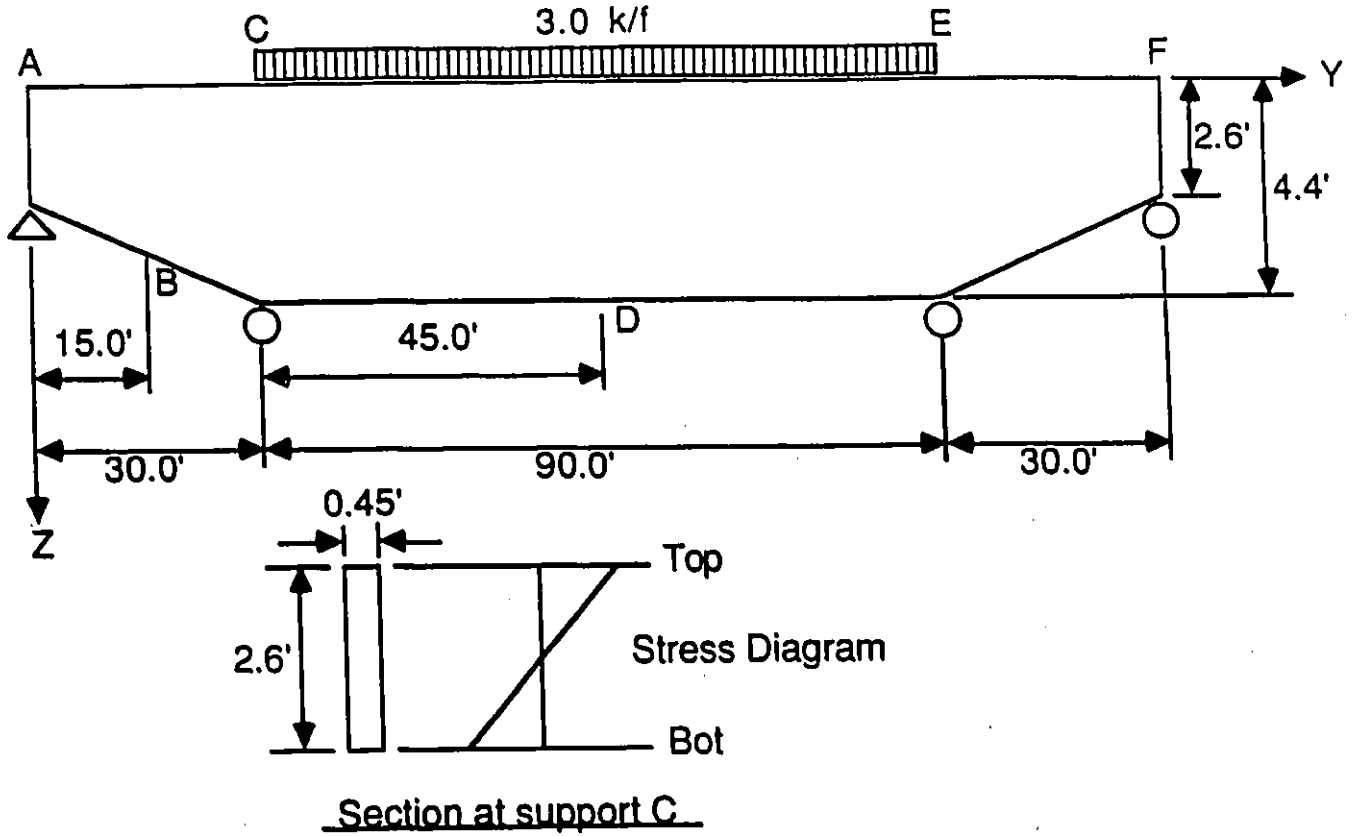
LOADS AND LAYOUT OF EXAMPLE 5.3.3
